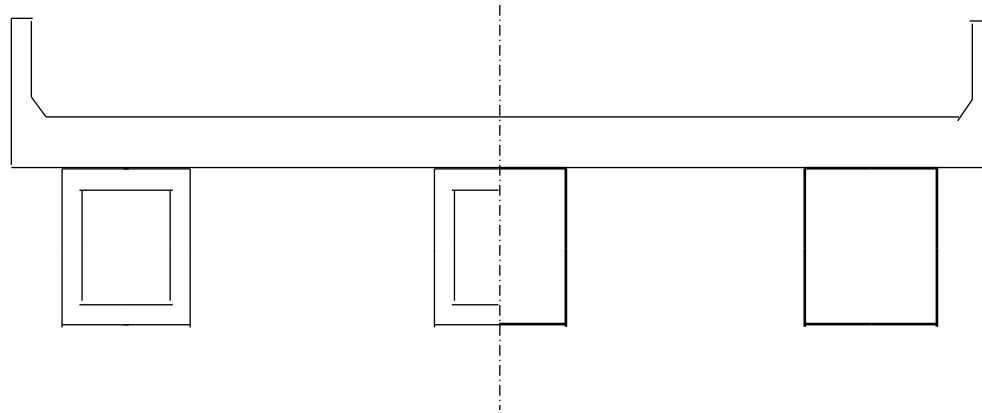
Cast-in-Place Concrete Slab over Closed Steel or Precast Concrete Boxes.
